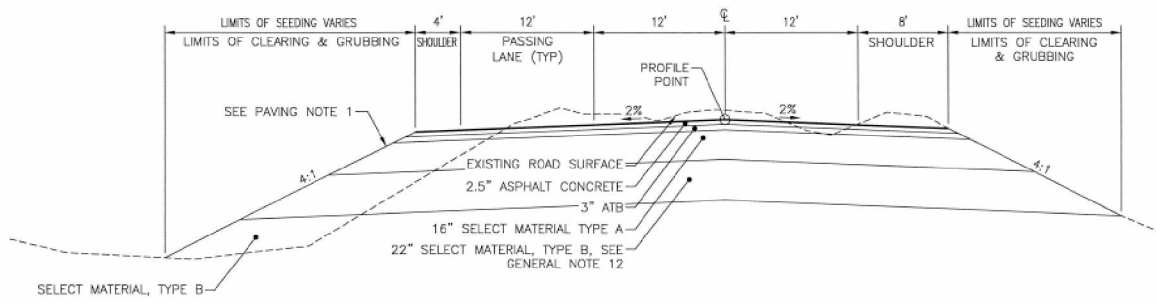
Healy, pavement structure IV (image courtesy ADOT&PF)
